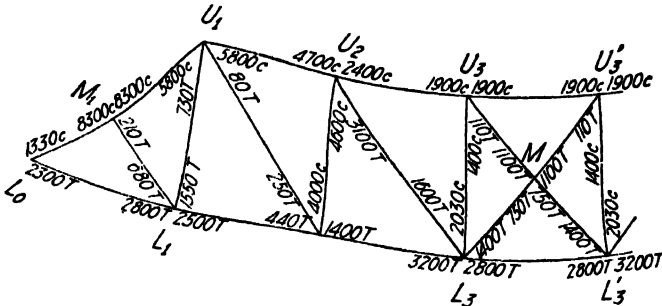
Secondary-stress Diagram of a 200-foot, Double-track-railway, Through, Riveted, Pratt-truss Span.
